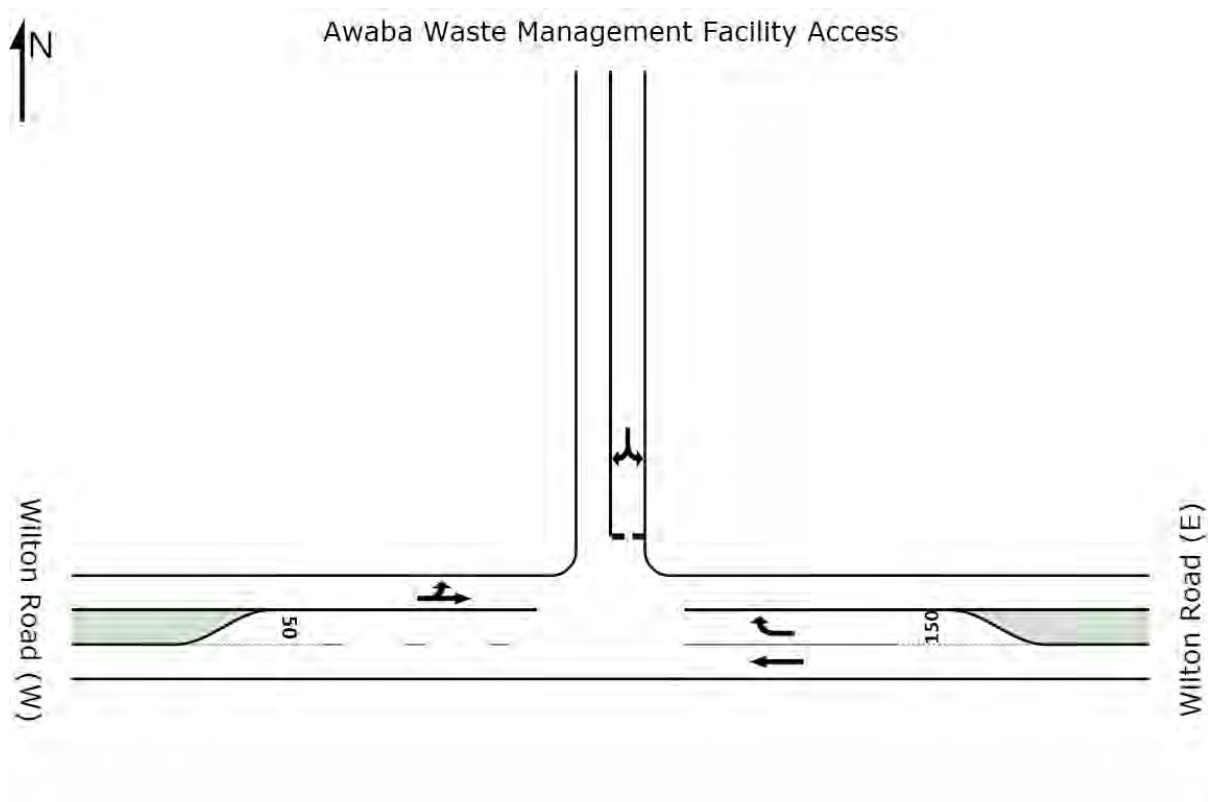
Existing Intersection Layout Wilton Road/Awaba Waste Management Facility Access Road
